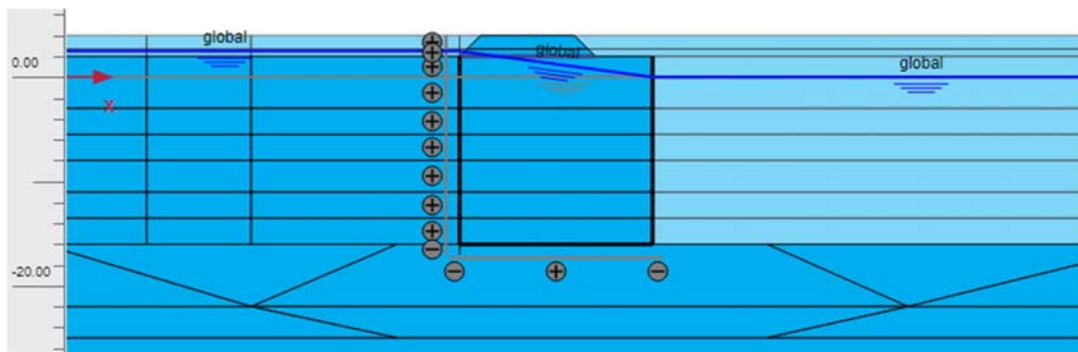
Hydraulic conditions, water level in hydraulic fill +2 m.
